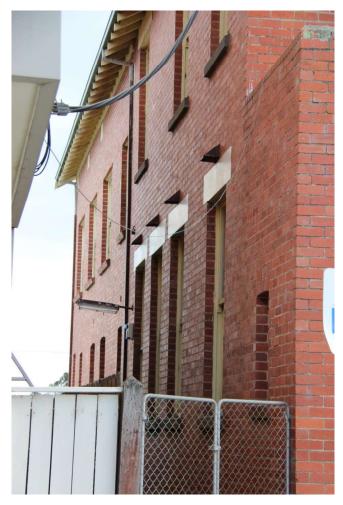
The south elevation. The 1950s addition to the first floor was built with wide eaves with exposed rafter ends, like the original 1913 section.
